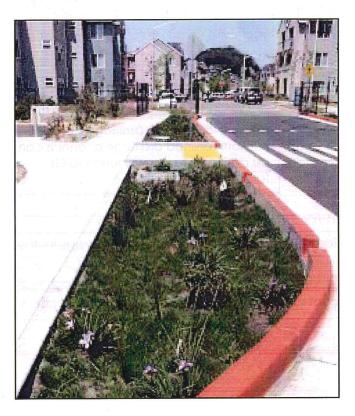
Curb Extension. In addition to reducing the street width and shortening the length of street crossings for pedestrians, curb extensions, or "bulbouts," such as this example in Albany, also provide space for GI facilities.
